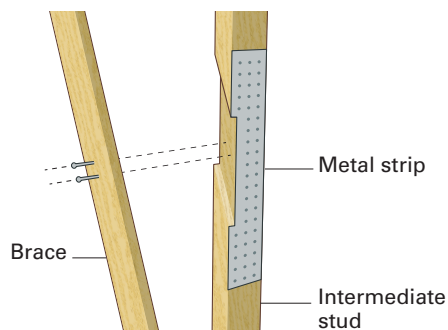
Brace connection - intermediate stud in the case of two crossed braces
